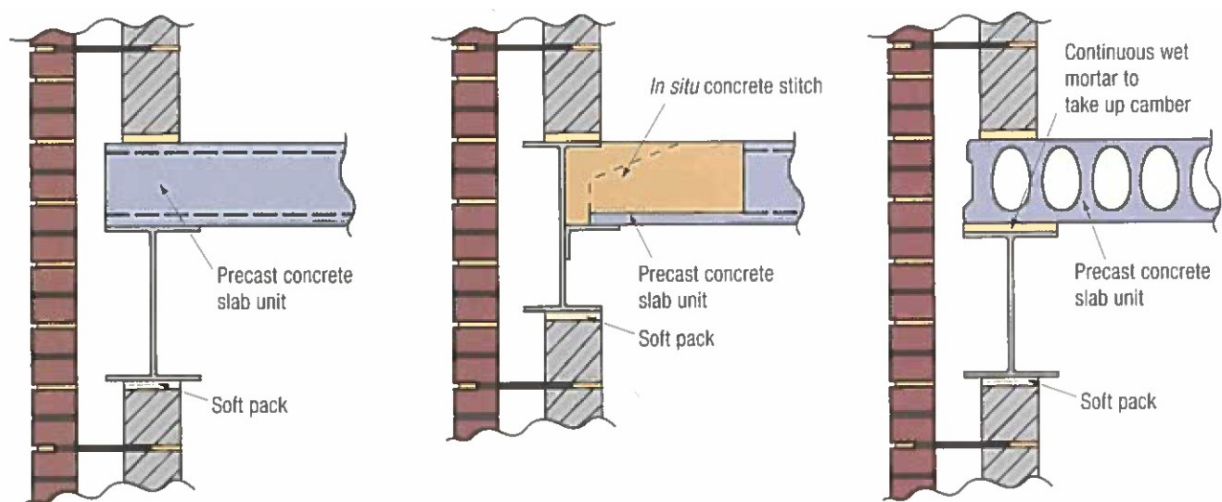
Anchorage of precast units to external steelwork by friction or embedment (The Institute of Structural Engineers, 2010)
